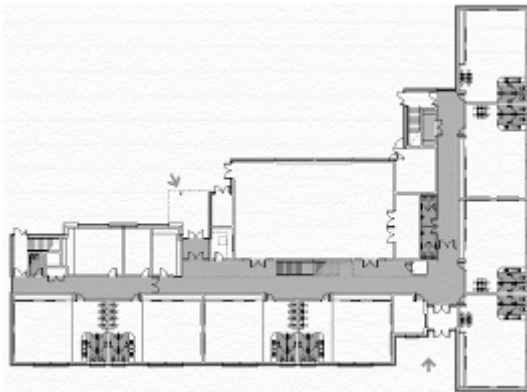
Ground Floor Plan – South & East facing classrooms. Alternative South & North Entrances.
